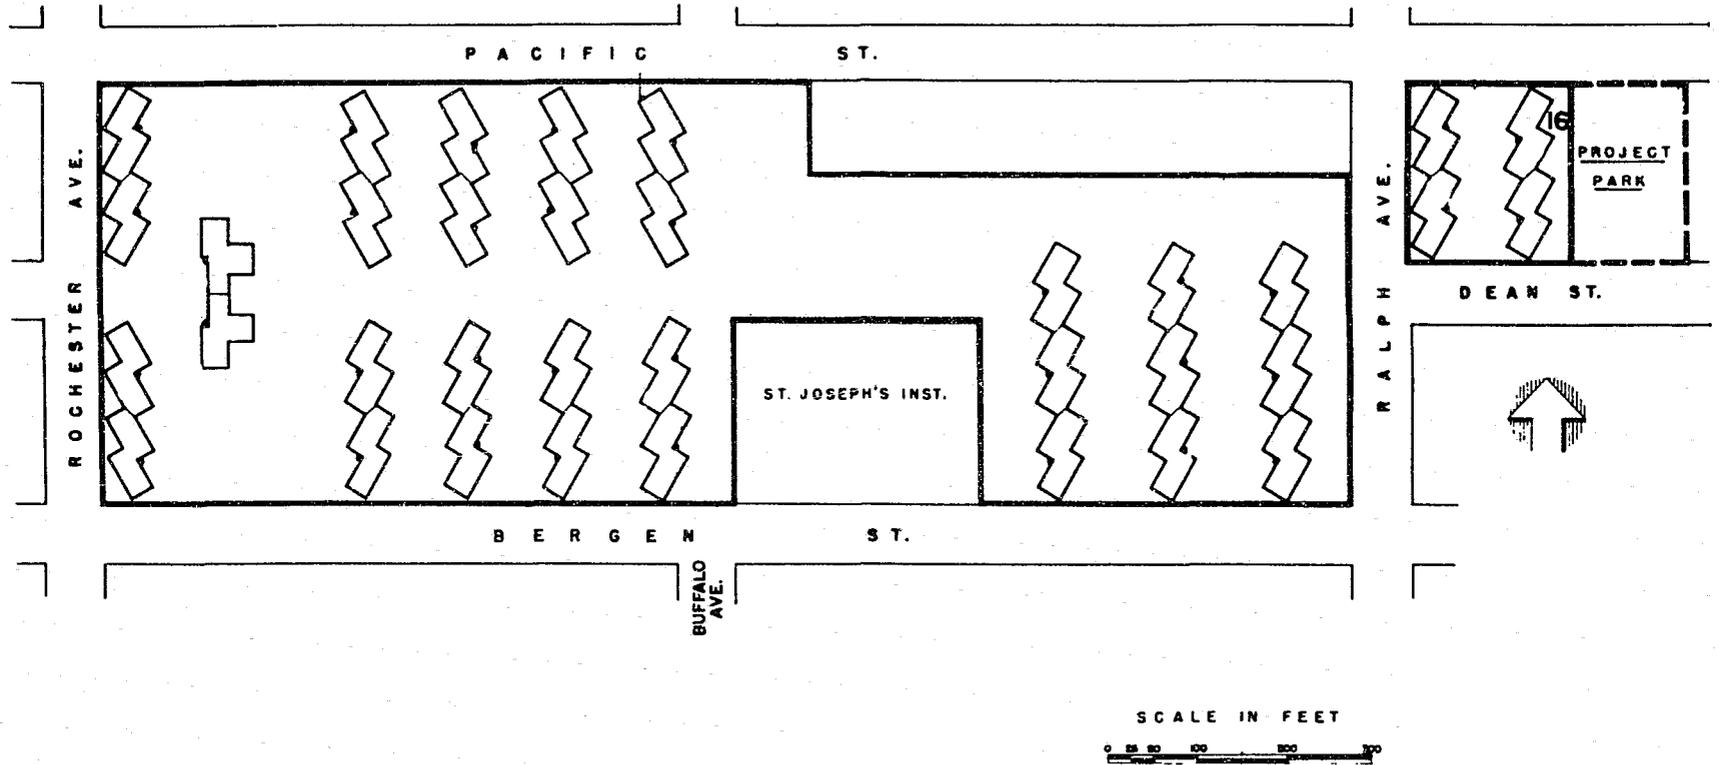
Kingsborough Houses, New York. Site plan.
